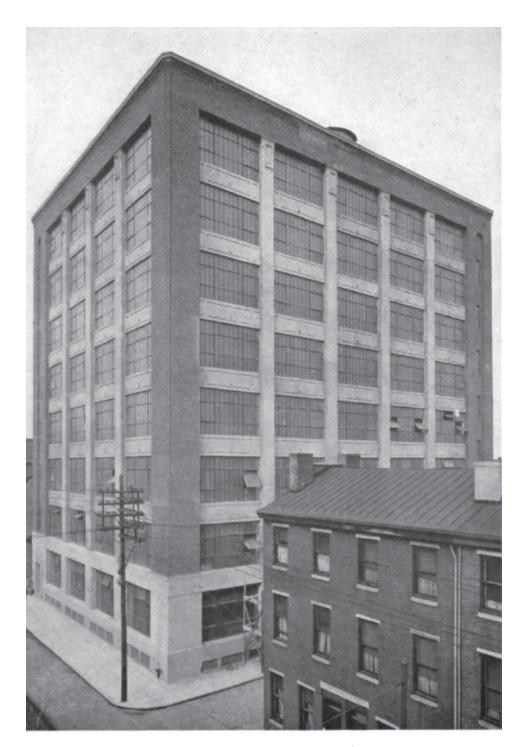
View of building northeast from 11th Street in 1916. (from *The Brickbuilder* 25.9, September 1916)
